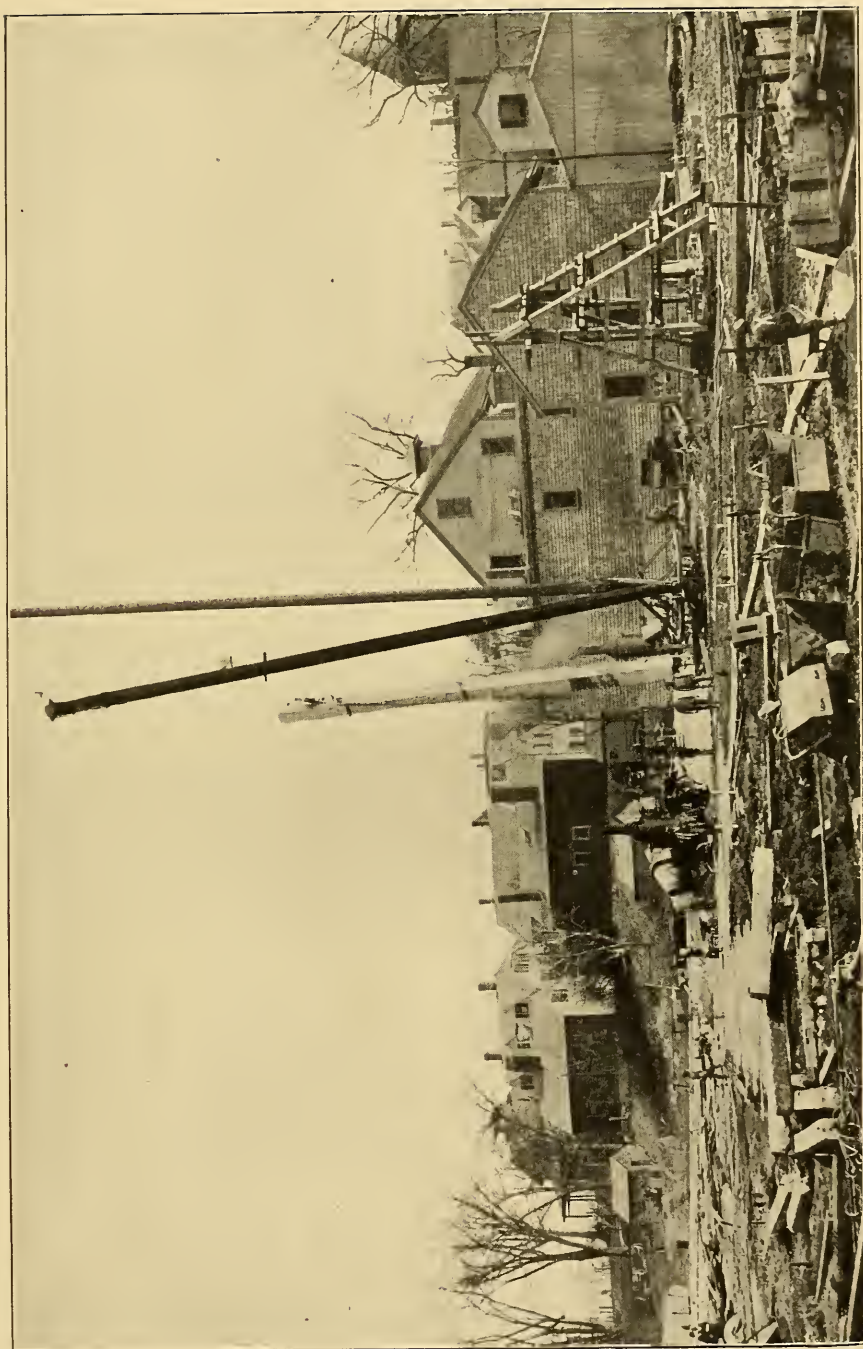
CAST PILES 36 FEET LONG, BEING HANDLED BY DERRICK PREPARATORY TO DRIVING.
